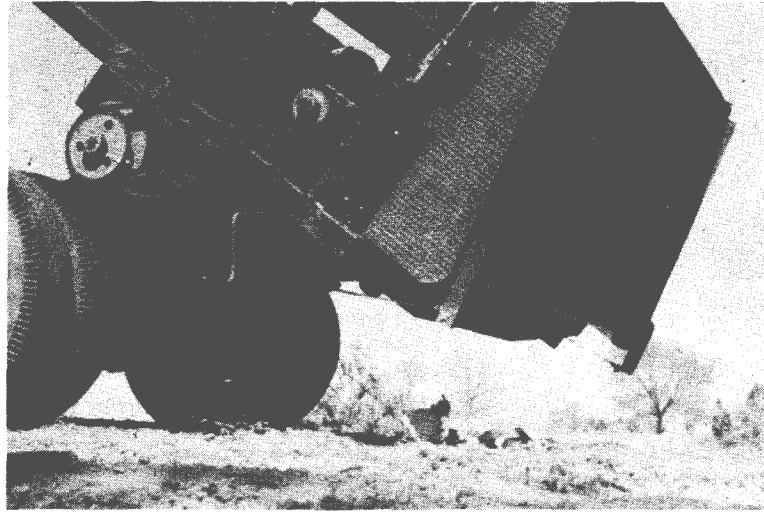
Side view of tail gate, showing cables used to control width of gate opening.
